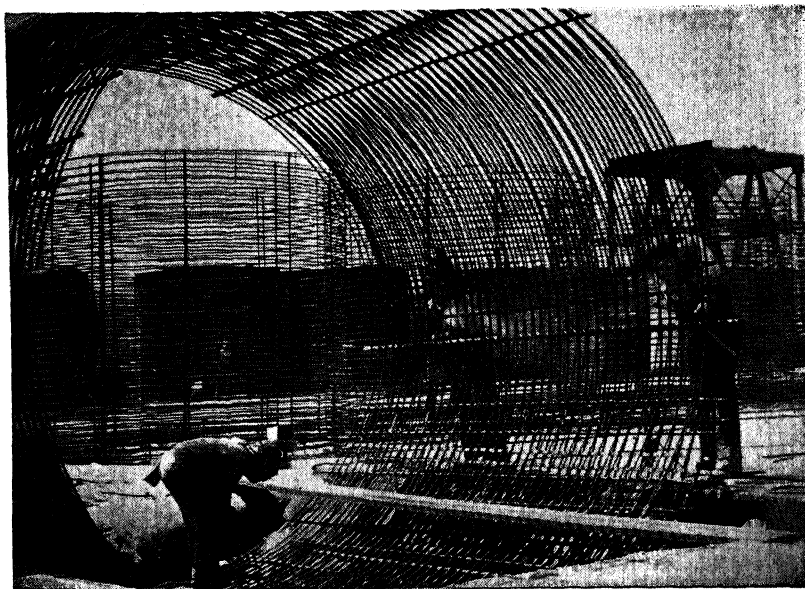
Fabricating steel reinforcement for concrete pipe sections for a large aqueduct. Each section of pipe weighs 44 tons.
